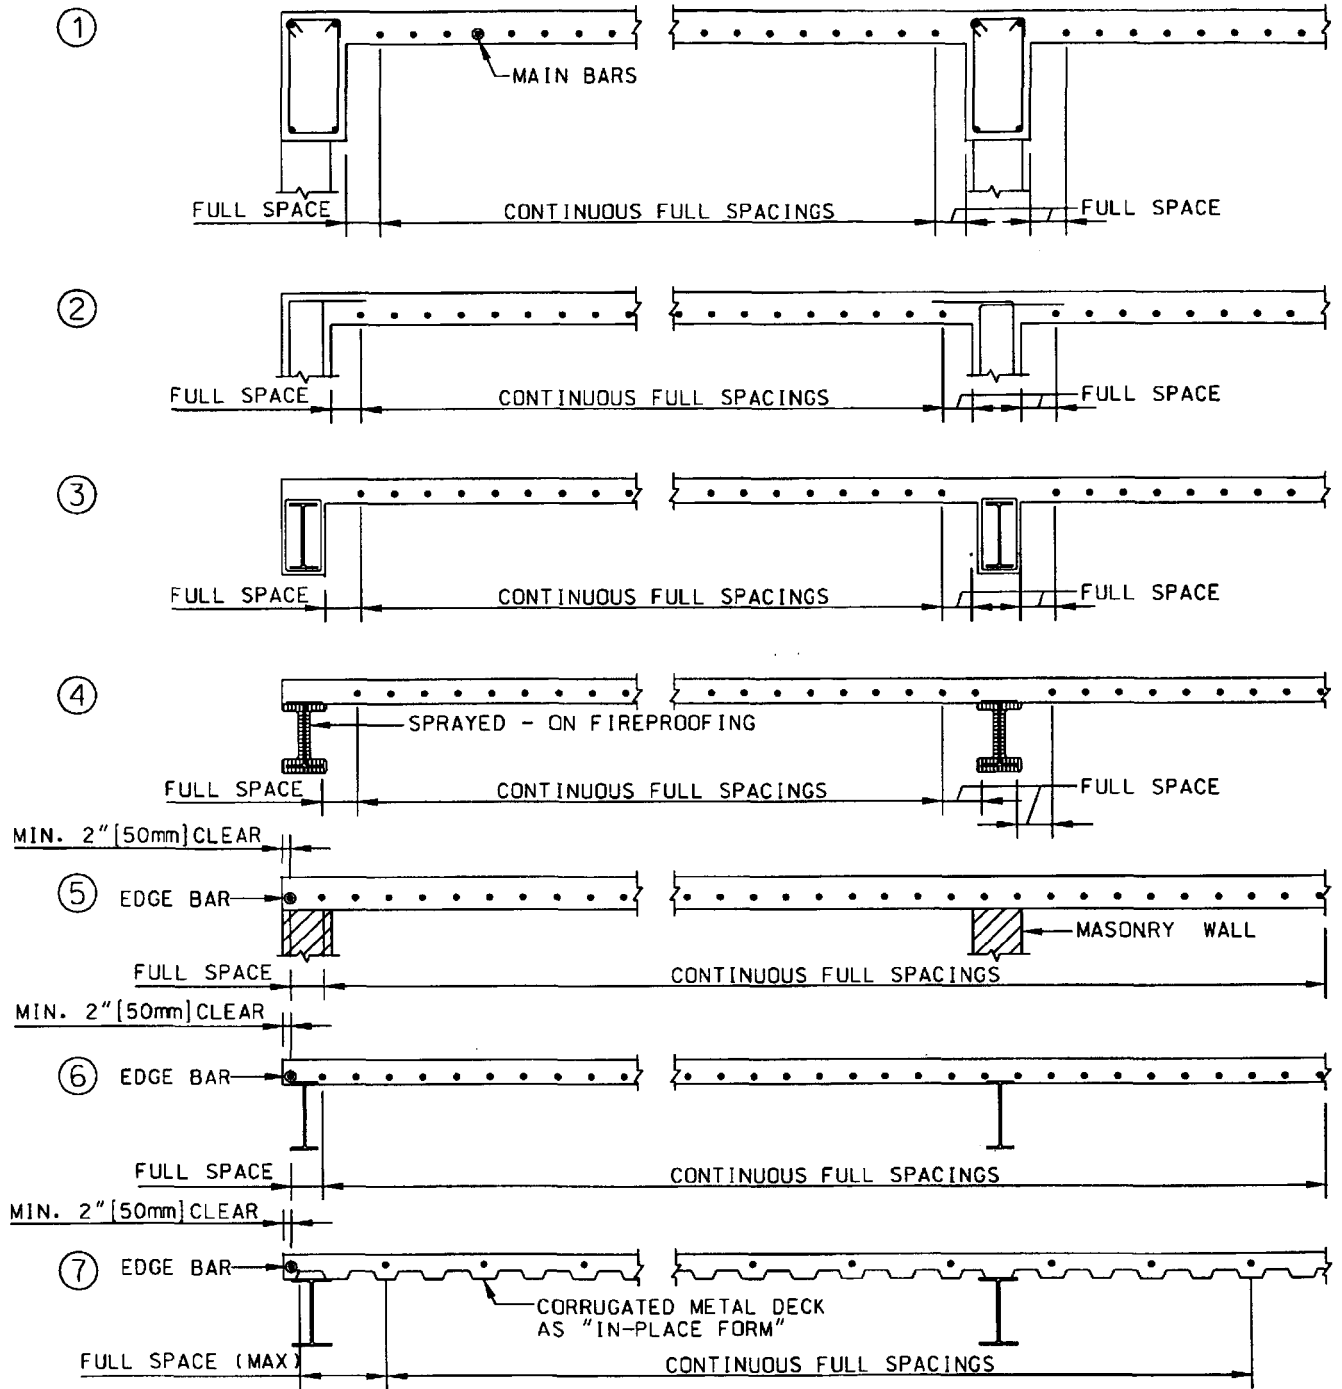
(a)—Location of first bar designated only by size and spacing, one-way slab main flexural reinforcing bars.
